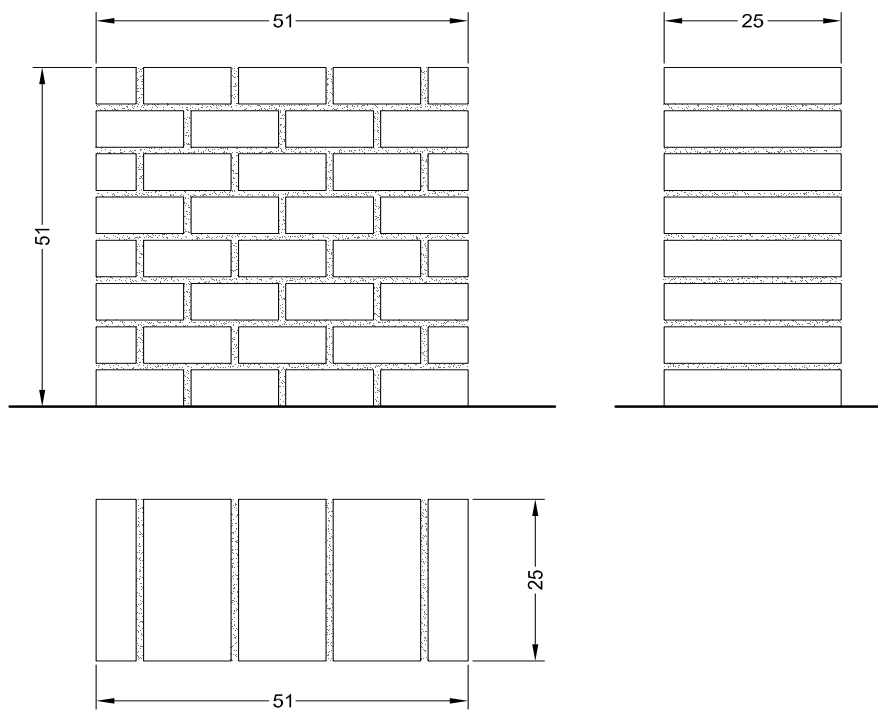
Orthogonal projection of the brick masonry panels (cm).
